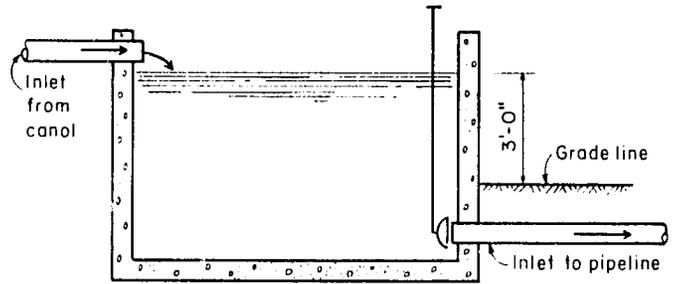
Cross-section of structure used to control water supply from open ditch to concrete pipe irrigation system. (Problem II).
